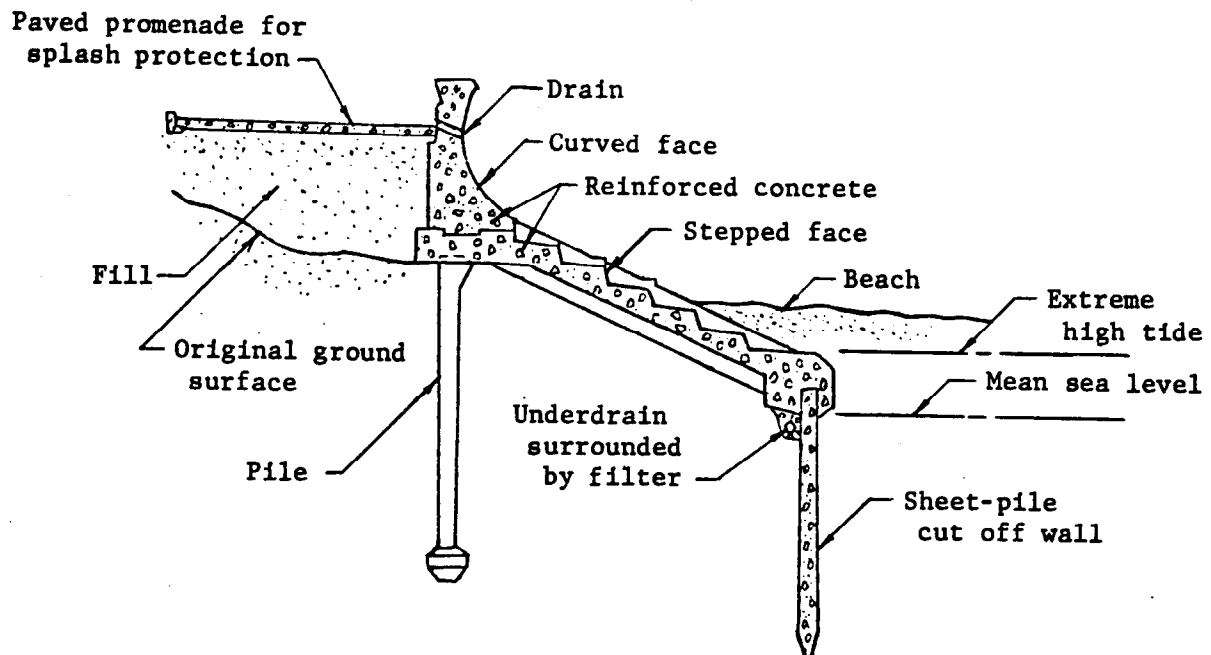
Reinforced Concrete Seawall with Combination Stepped and Curved Seaward Face
